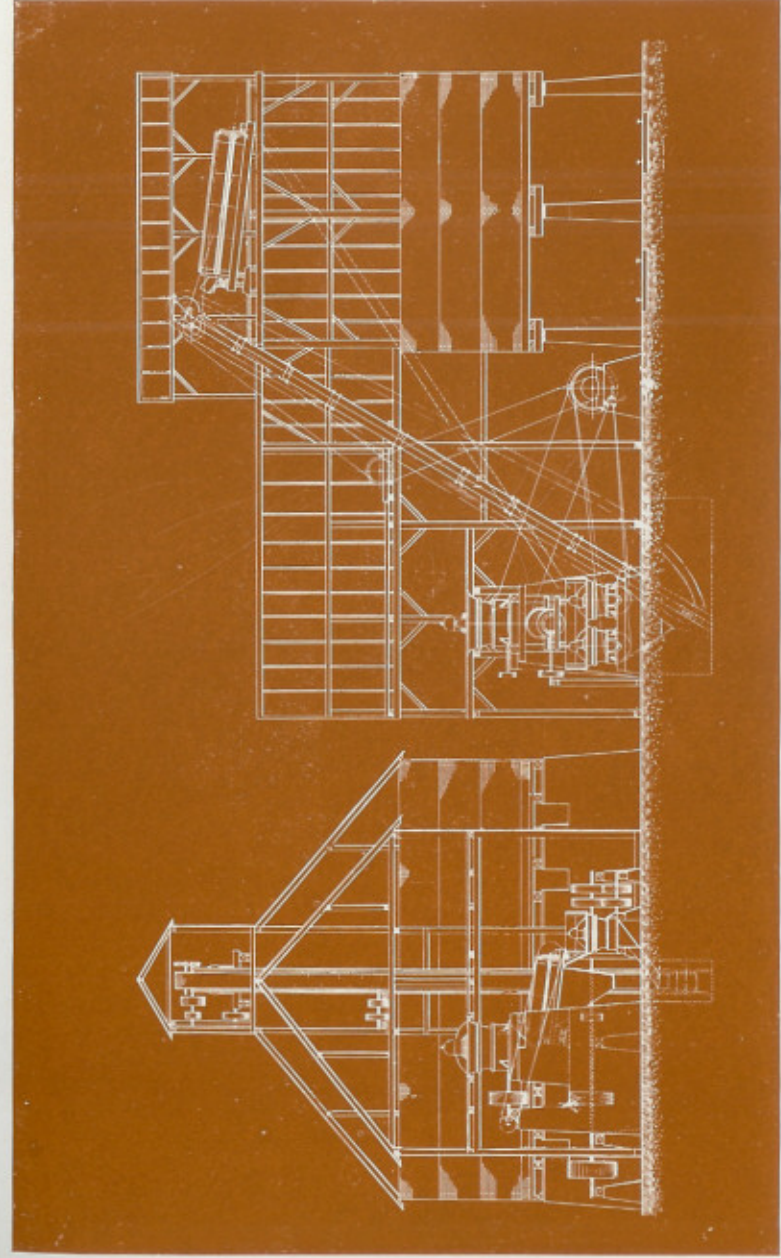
Crushing plant, consisting of one No. 7½ and two No. 4 Symons Crushers, with single elevator.
